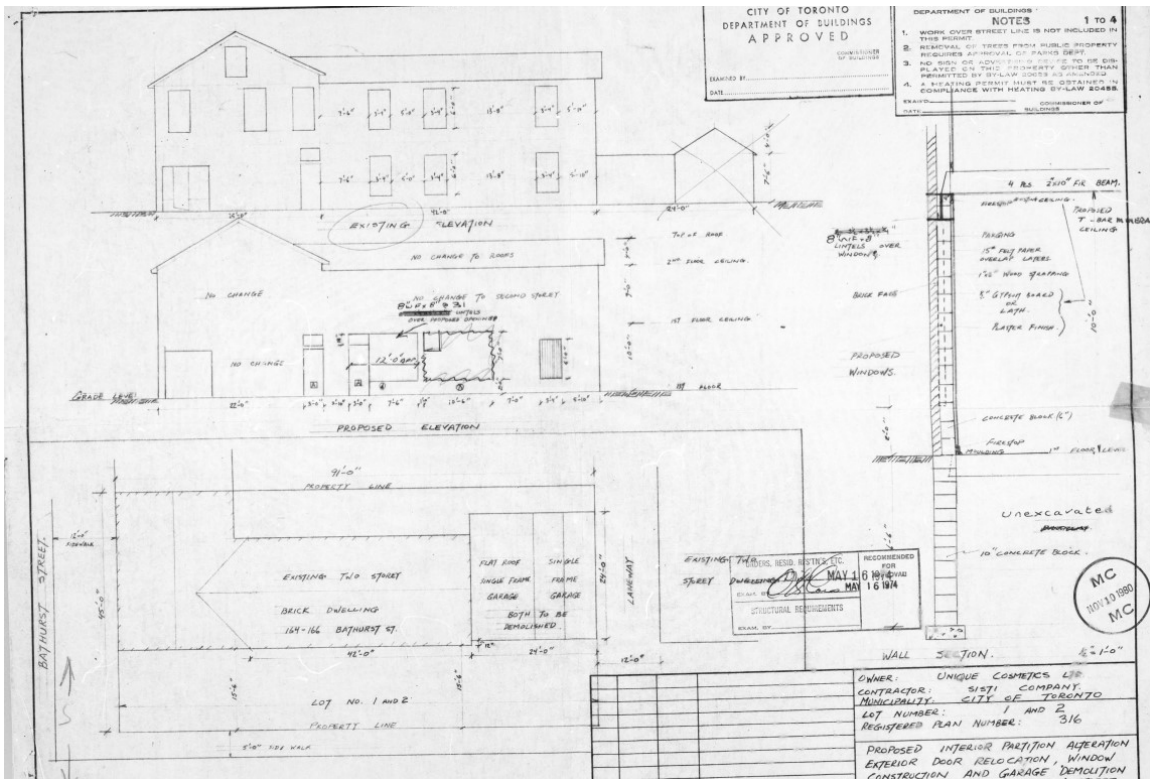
Drawings of existing and proposed north elevations related to garage demolition, prepared by Sisti Company, 1974. (City of Toronto Building Records.)
